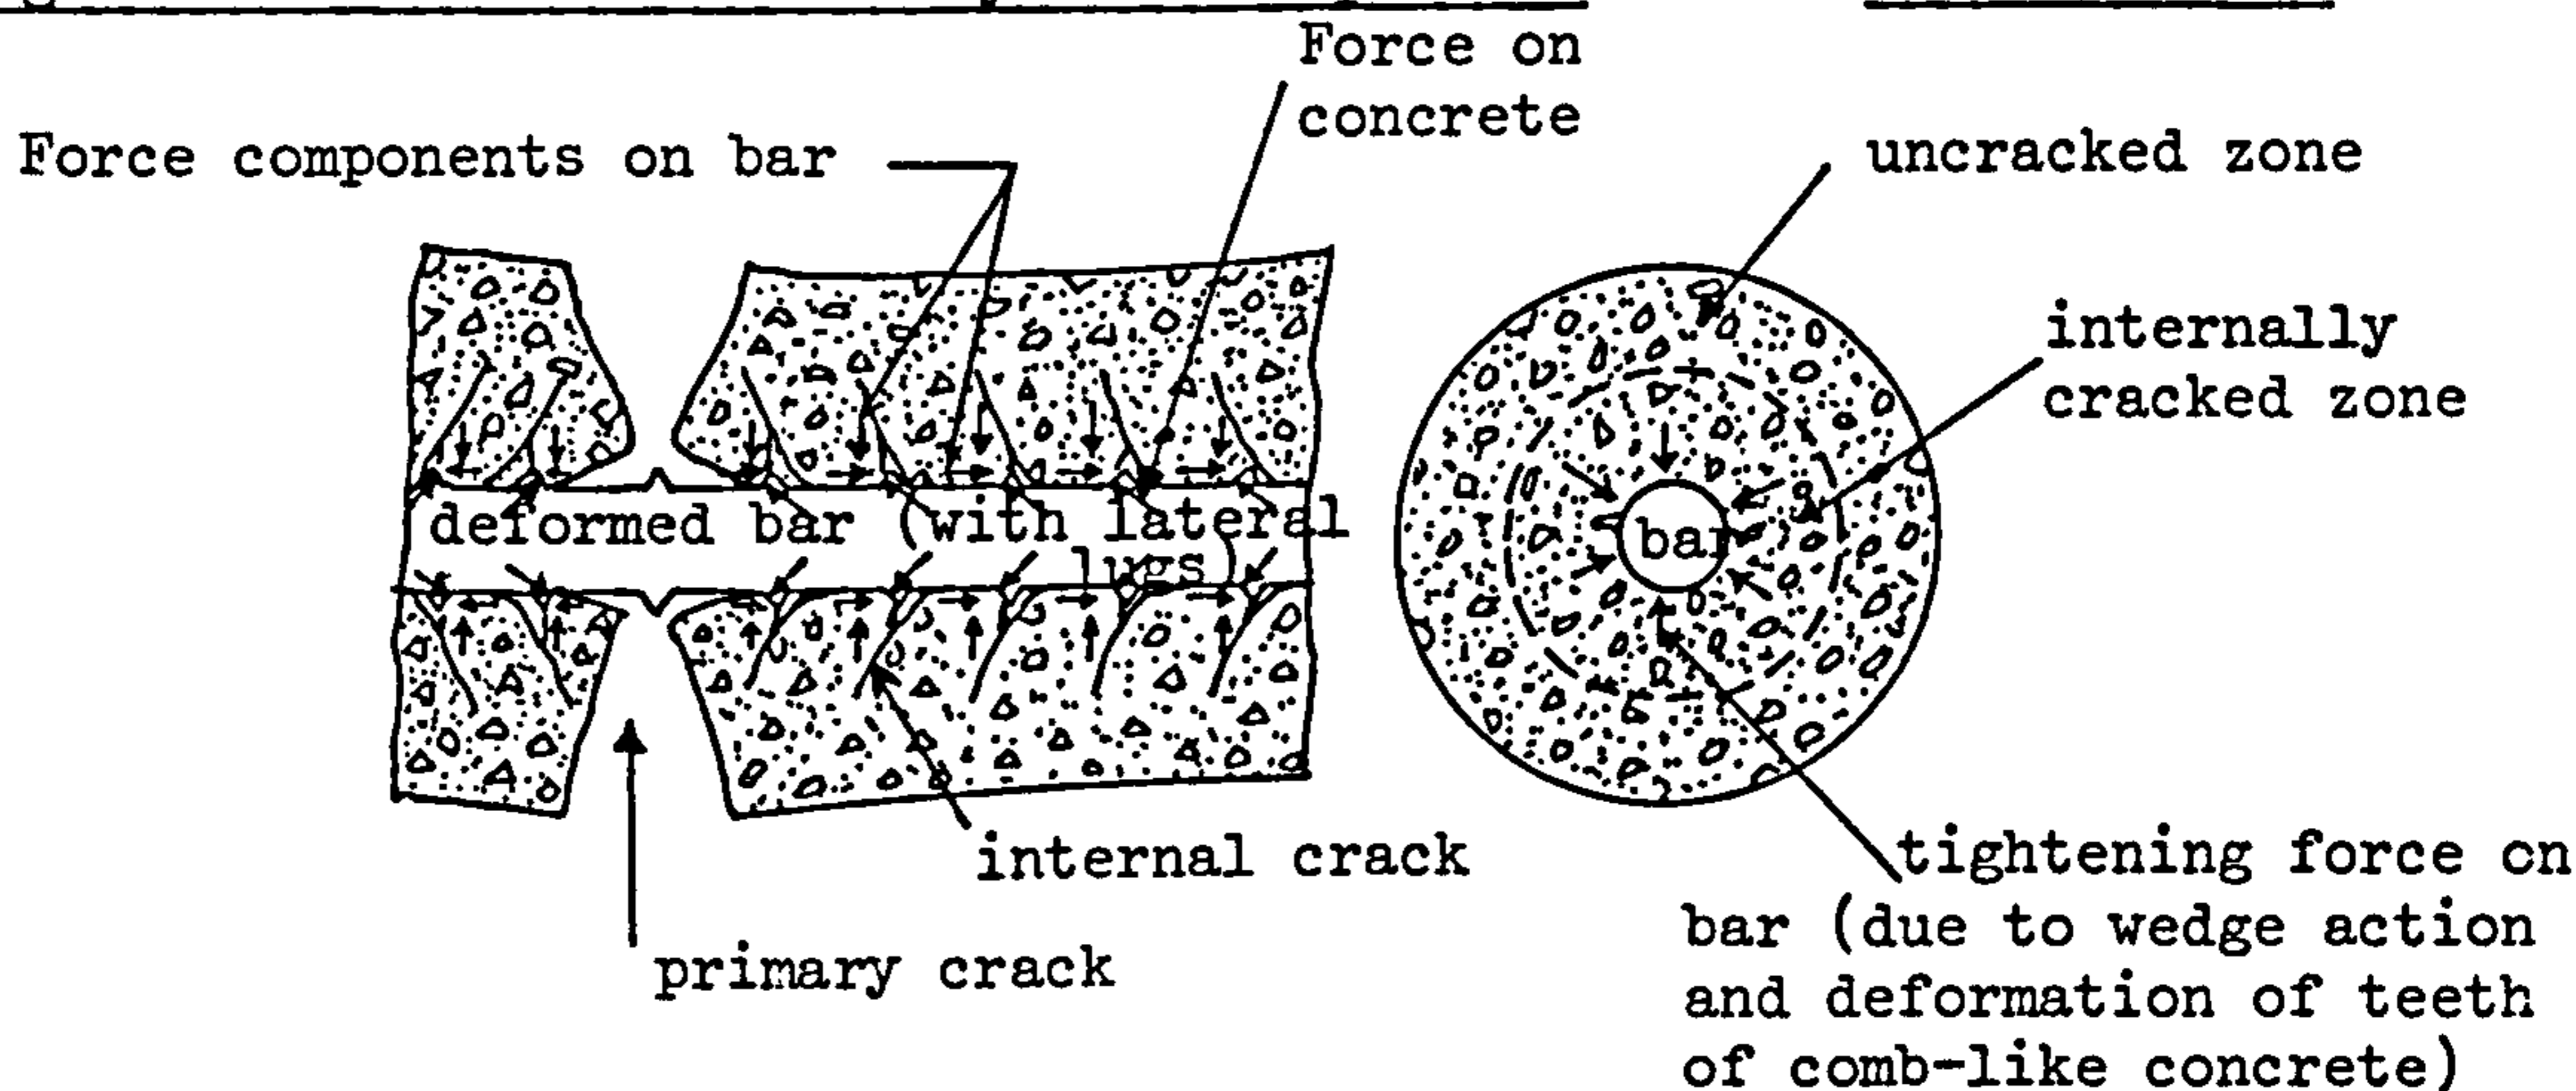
Deformation of concrete around Reinforcing Bars (after formation of internal cracks)(Taylor). (116)
